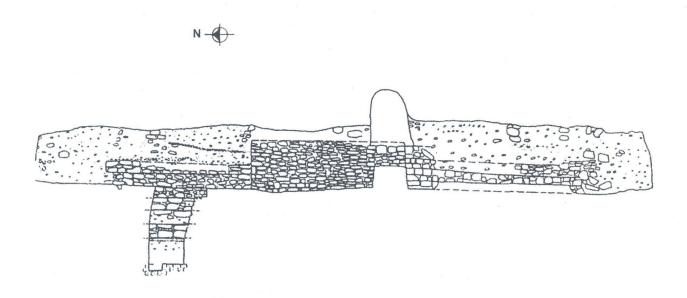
West facade of Building 216 Sub 1, Yaxha.
